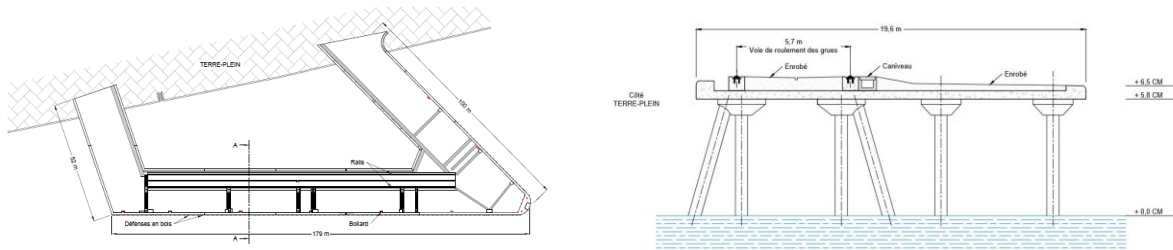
Left: Plan view of the wharf with the access pier on the right; Right: transversal cross section of the wharf
